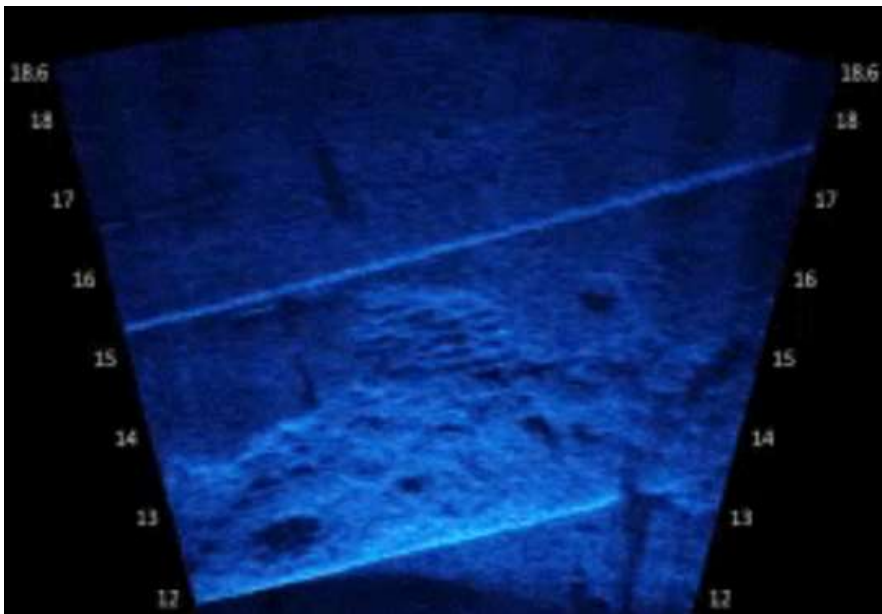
Spalling of cast concrete surface with exposed rebar shown with ultra-high-resolution imaging sonar.
